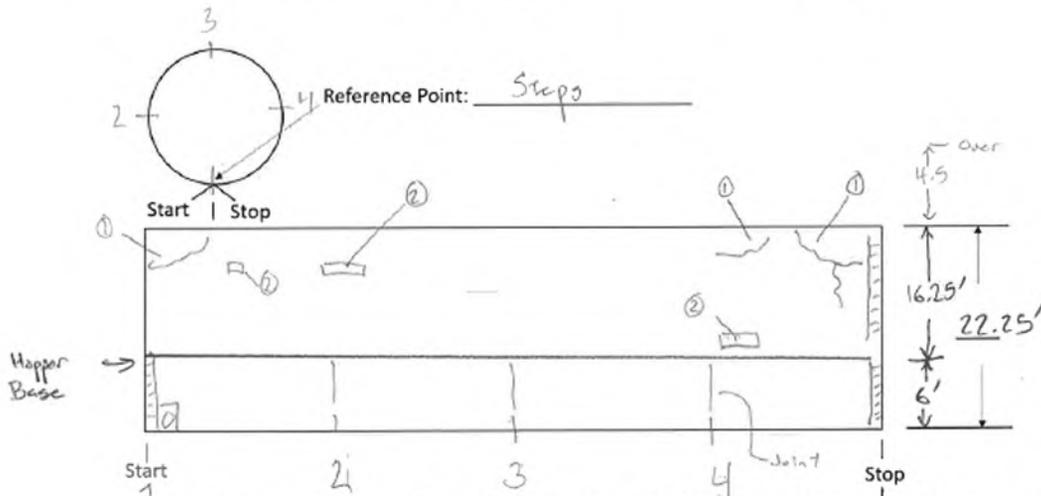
Reservoir INTERIOR WALL Elevation– Note location of ladders and other features.
